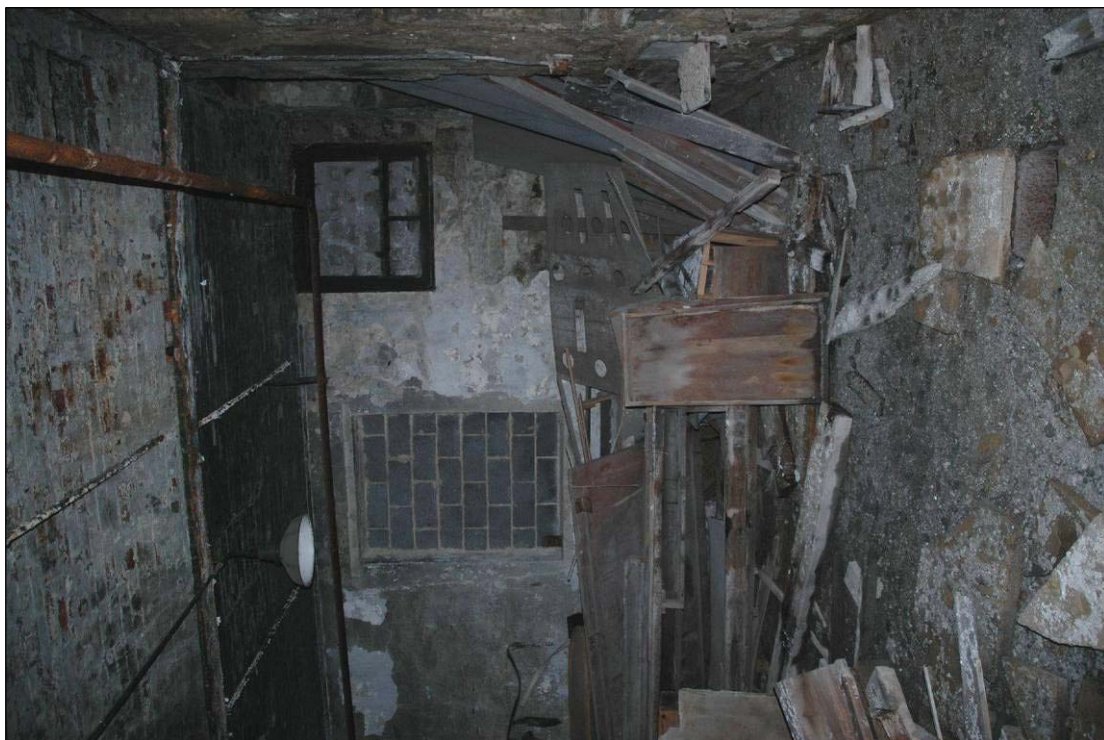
First floor of building 1, looking west, showing wall box and blocked window (2005)
